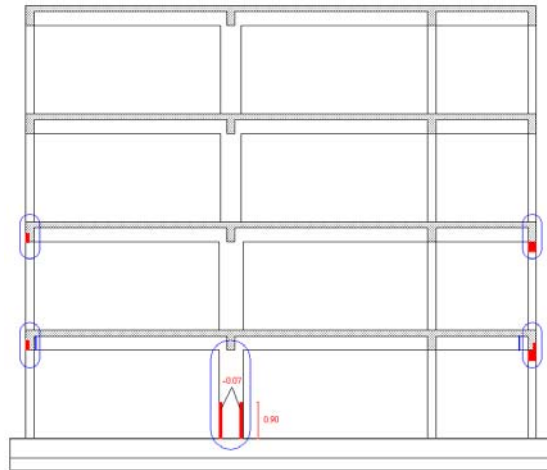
Repair operations (steps): 4 – remove concrete at the top of the damaged column; 5 – relocation of the column; 6 – concreting of the column/joint; 7 – strengthening with carbon fibre
